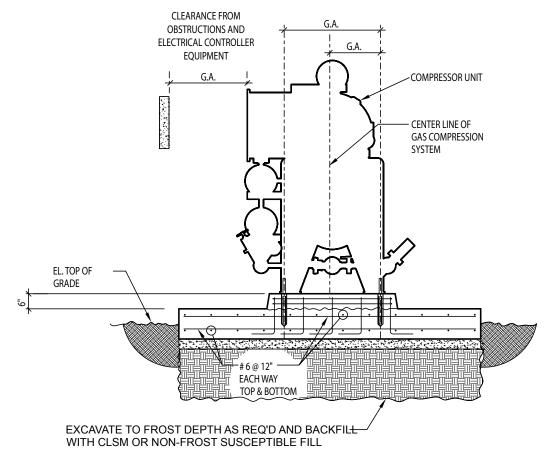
Concrete Pad with Compressor Unit Dimensions - Front View
